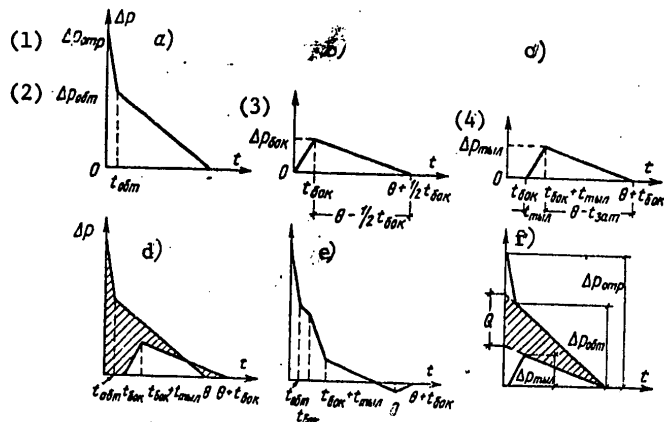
Diagrams of the average loads on a ground structure without openings, a -- on the front (turned toward the blast center) wall; b -- on the roof and side walls; c -- on the rear walls; d and e -- resultant horizontal load; f -- special case of the resultant horizontal load on structures of small dimensions.
